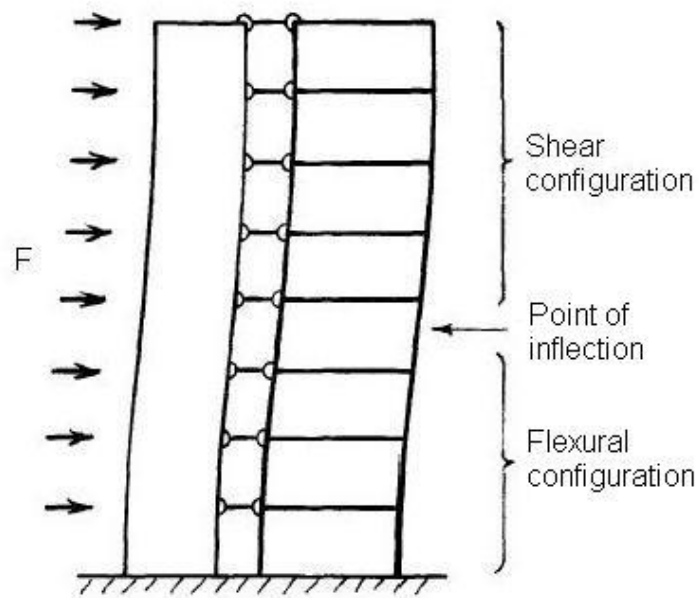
4. Typical Deflected Shape of Wall-Frame Structure [35]
